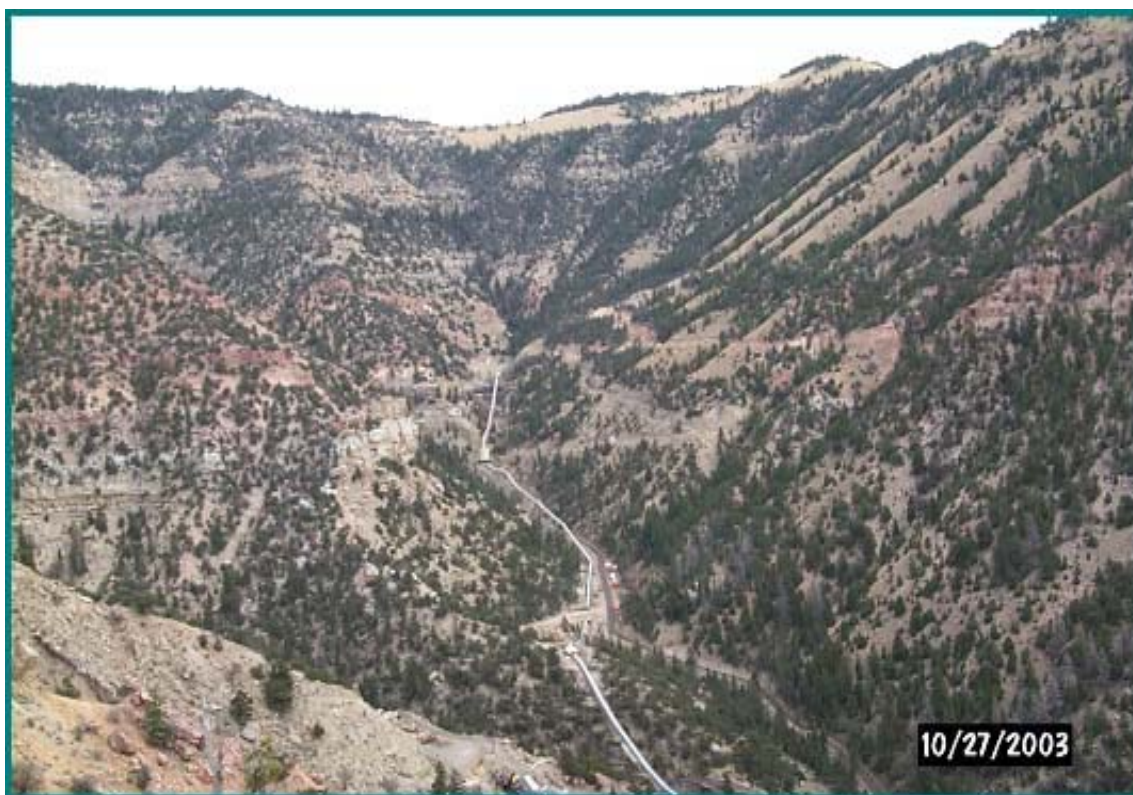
~~Cross~~ Wild Horse Ridge Conveyor Belt
